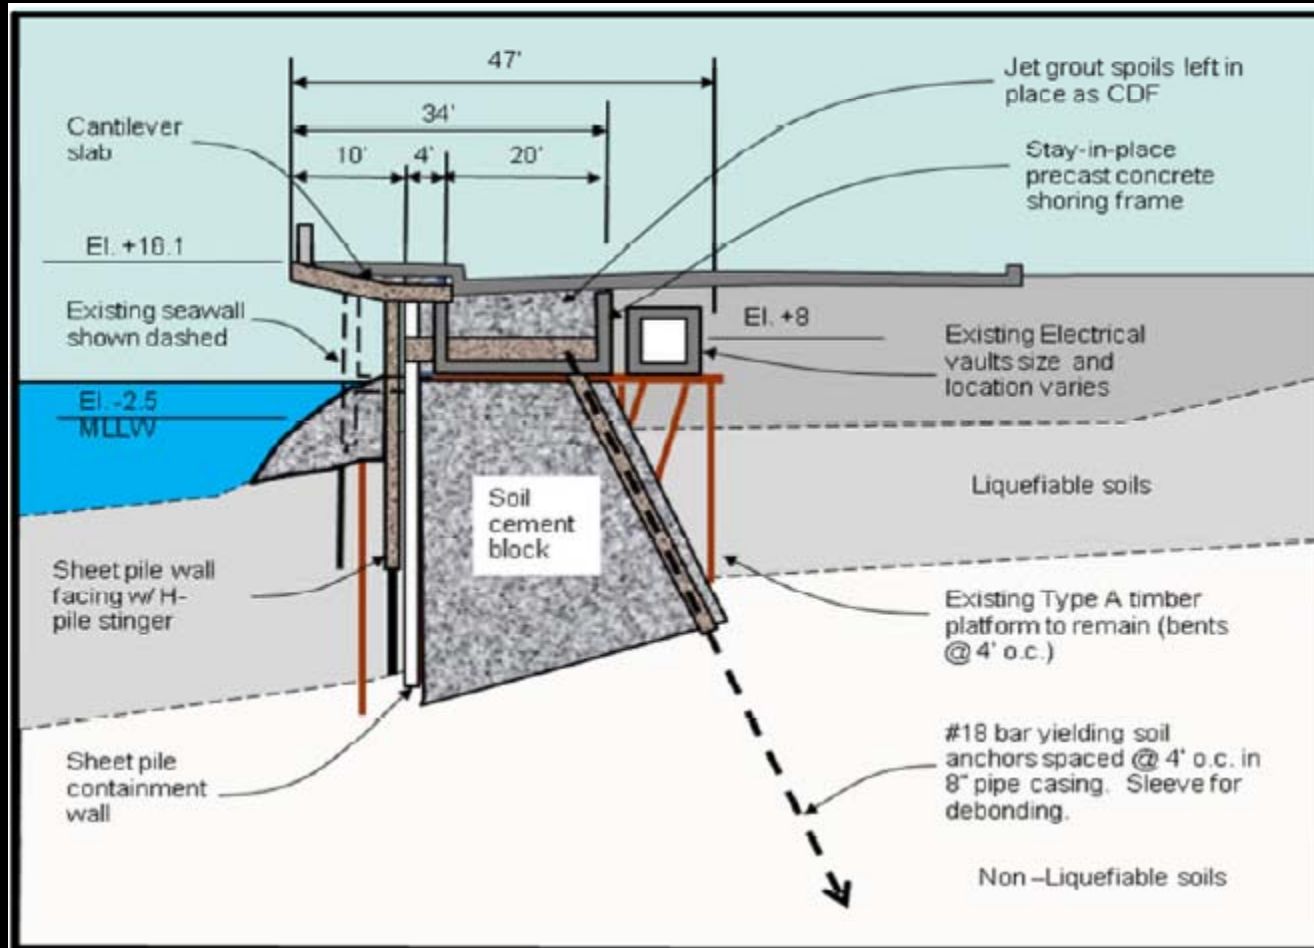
Proposed Type A Anchored Soil Improvement Concept
